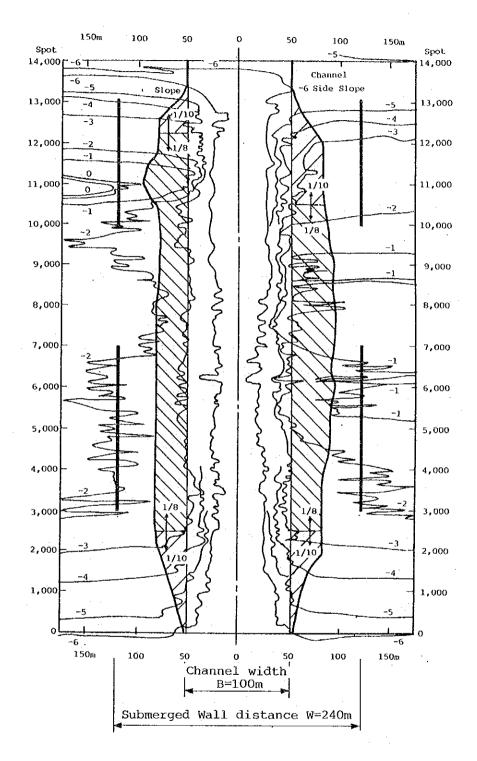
The First-stage Plan of the Submerged Wall Arrangement
